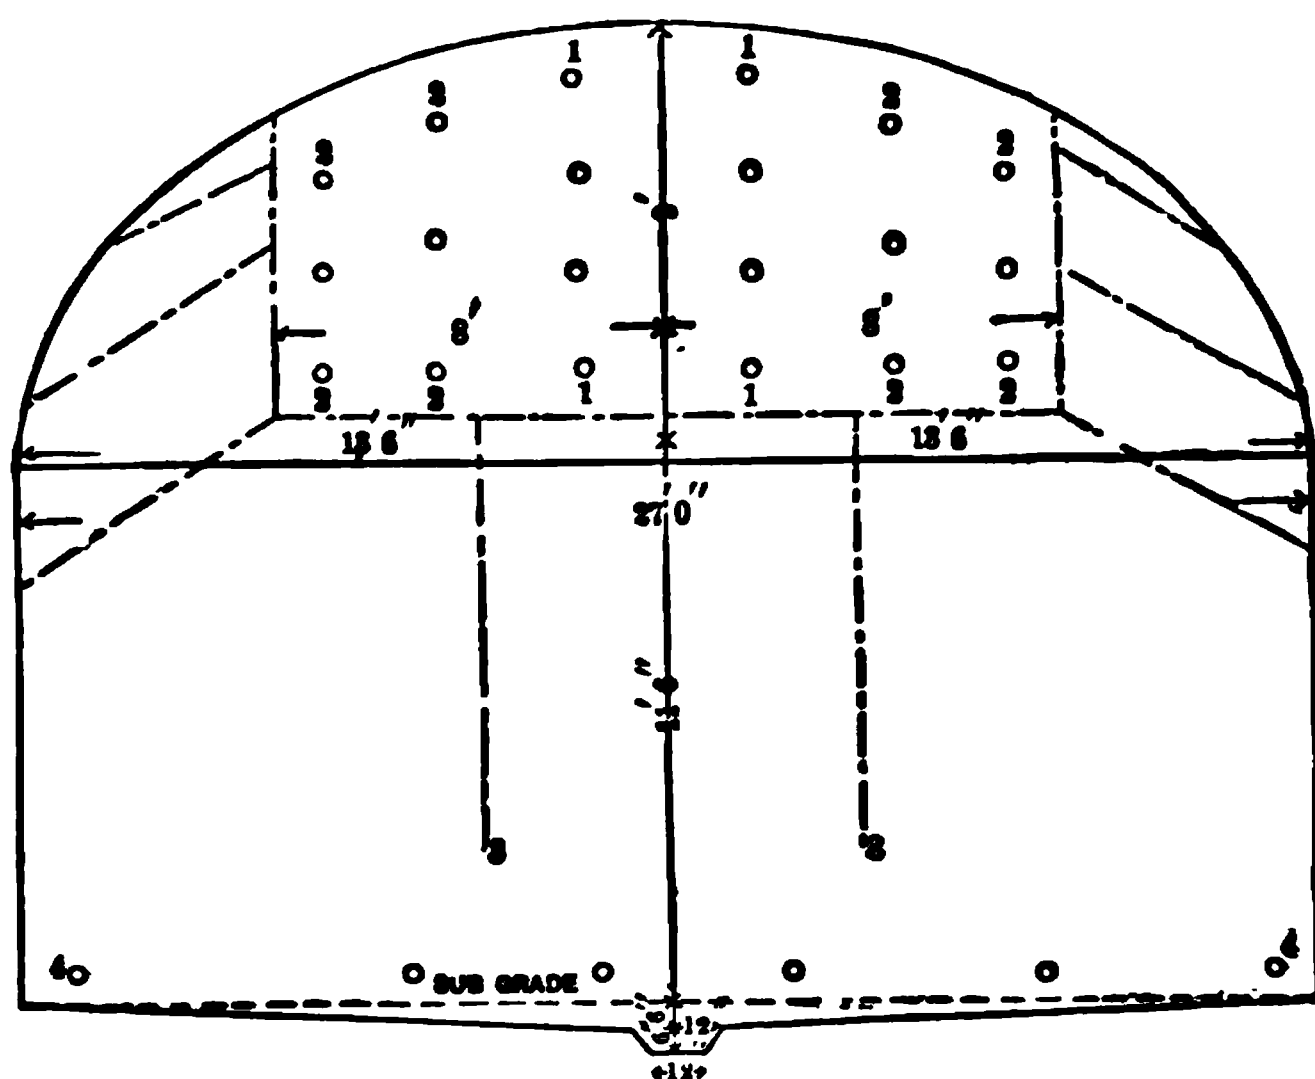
The Centre-cut System of Drilling Wide Tunnels.
